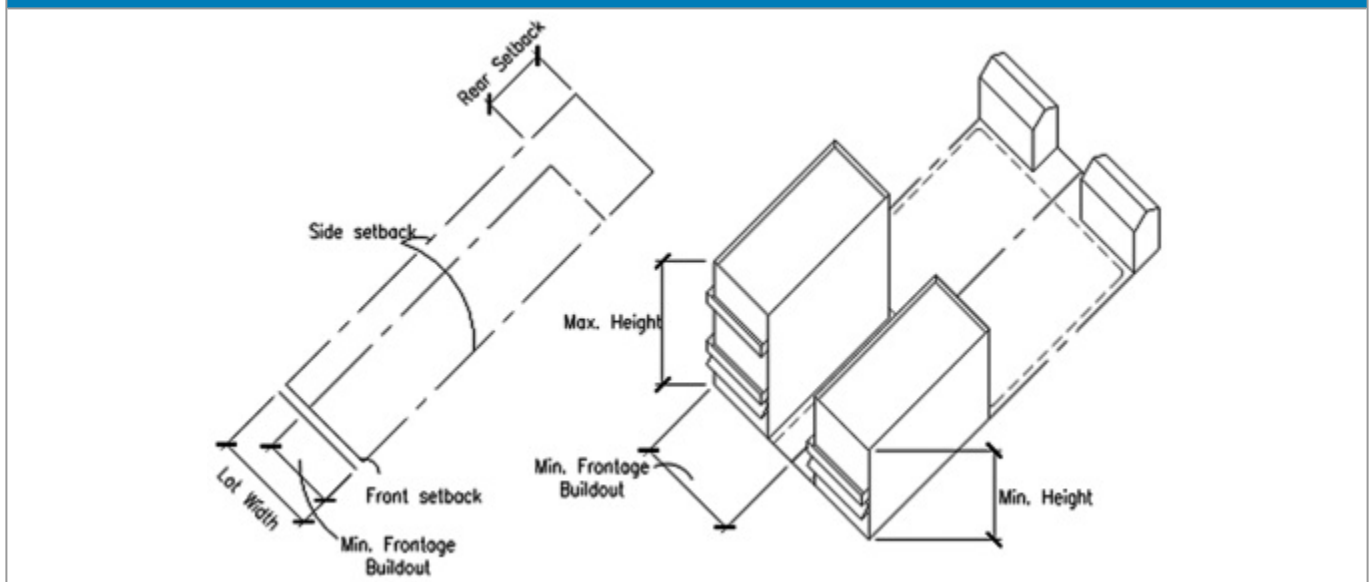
A: EXAMPLES OF MIXED-USE BUILDINGS
